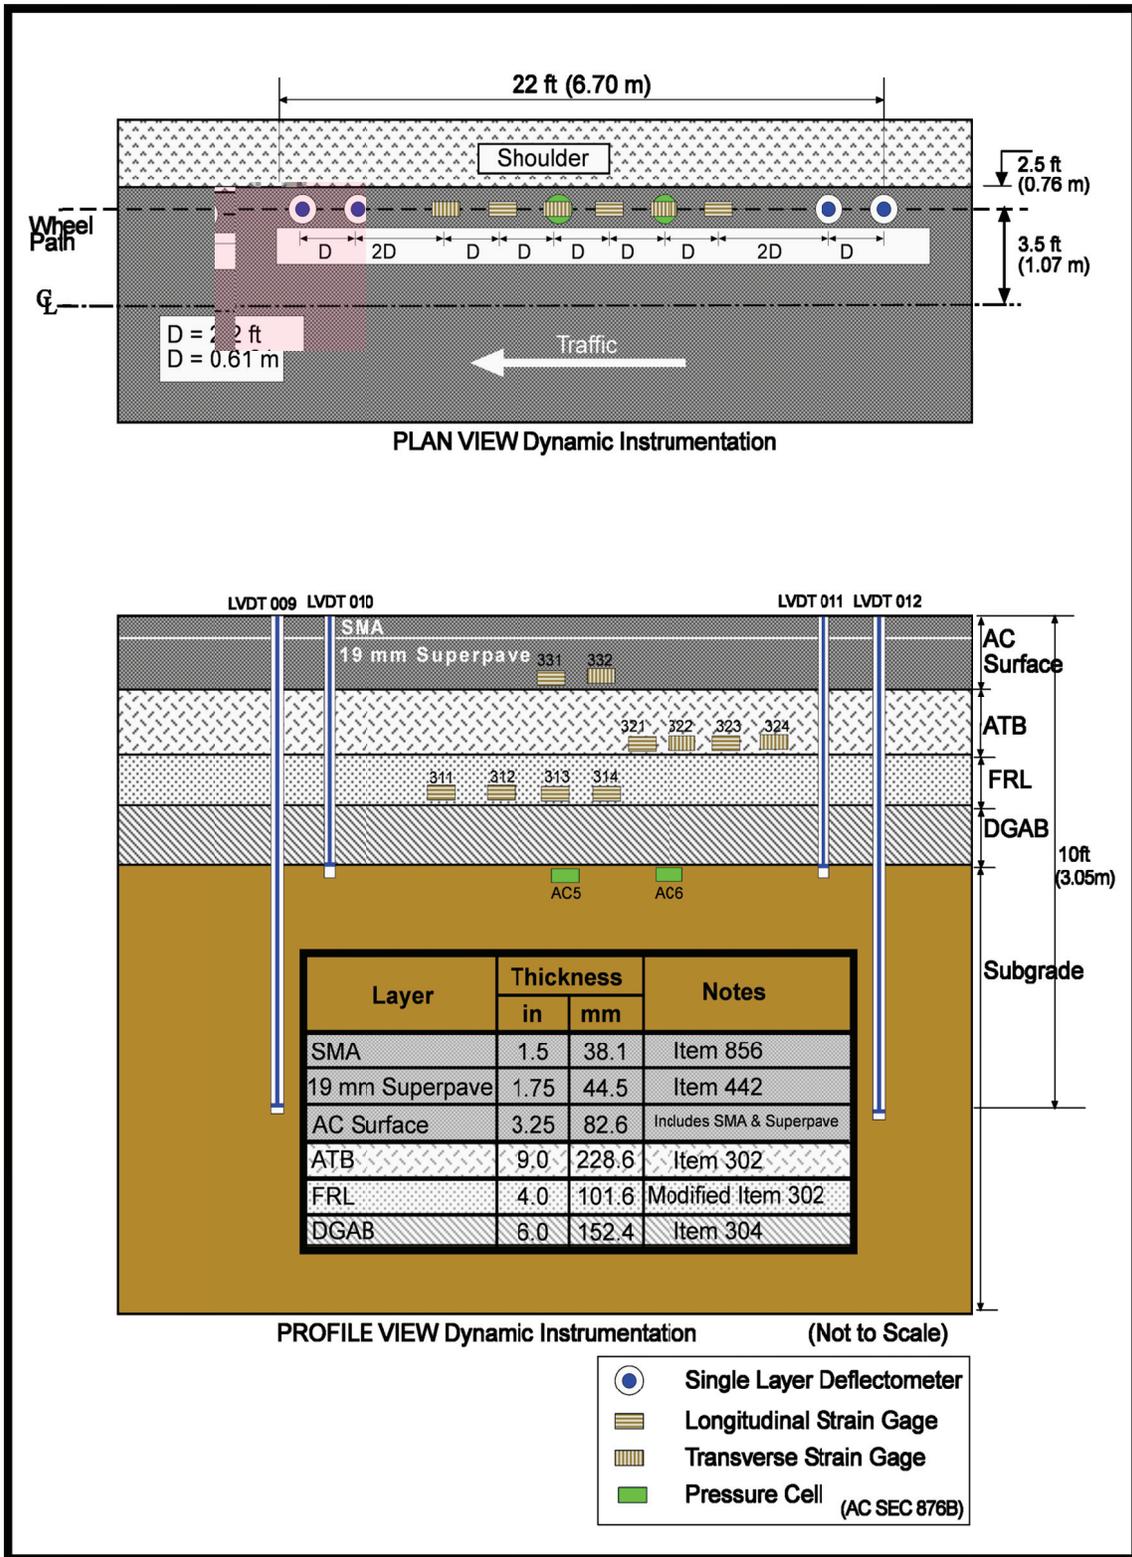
Instrumentation Plan and Profile Views for AC Section 876B
